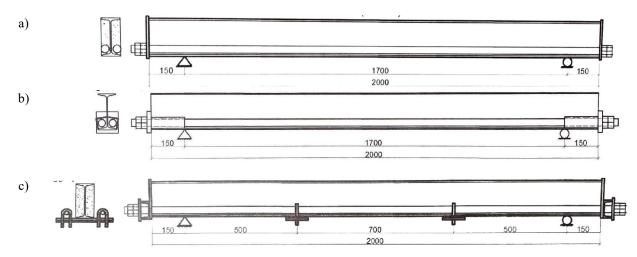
Schemes of additional prestressed internal (a-b) and external (c) reinforcement of reinforced concrete beams
